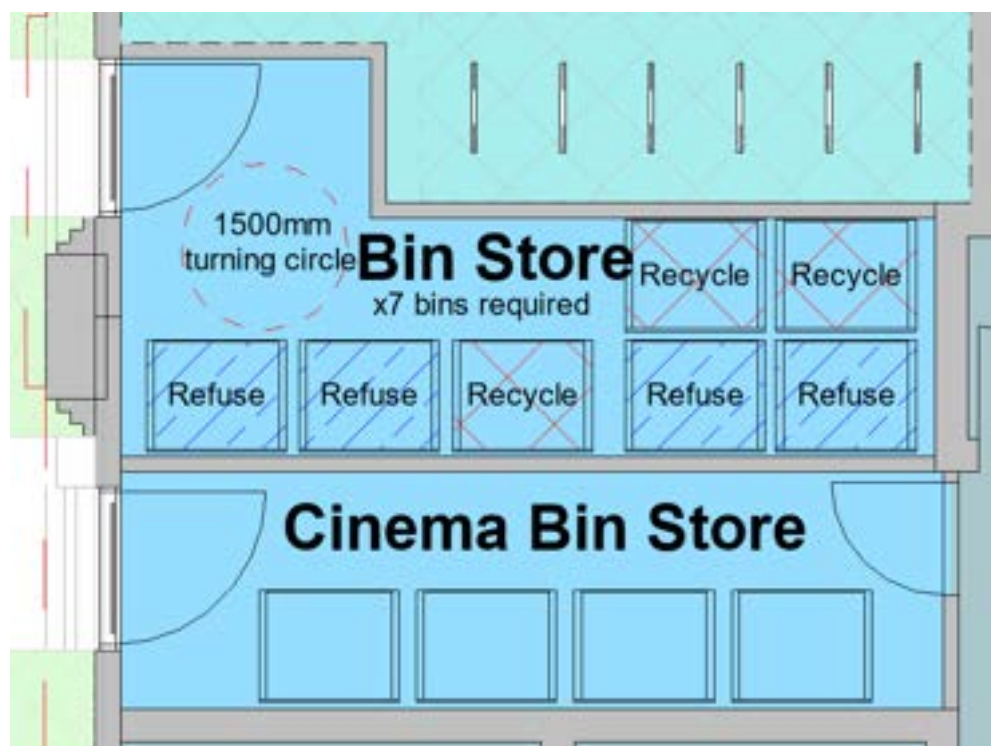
Layout of proposed Bin Store (not to scale)
